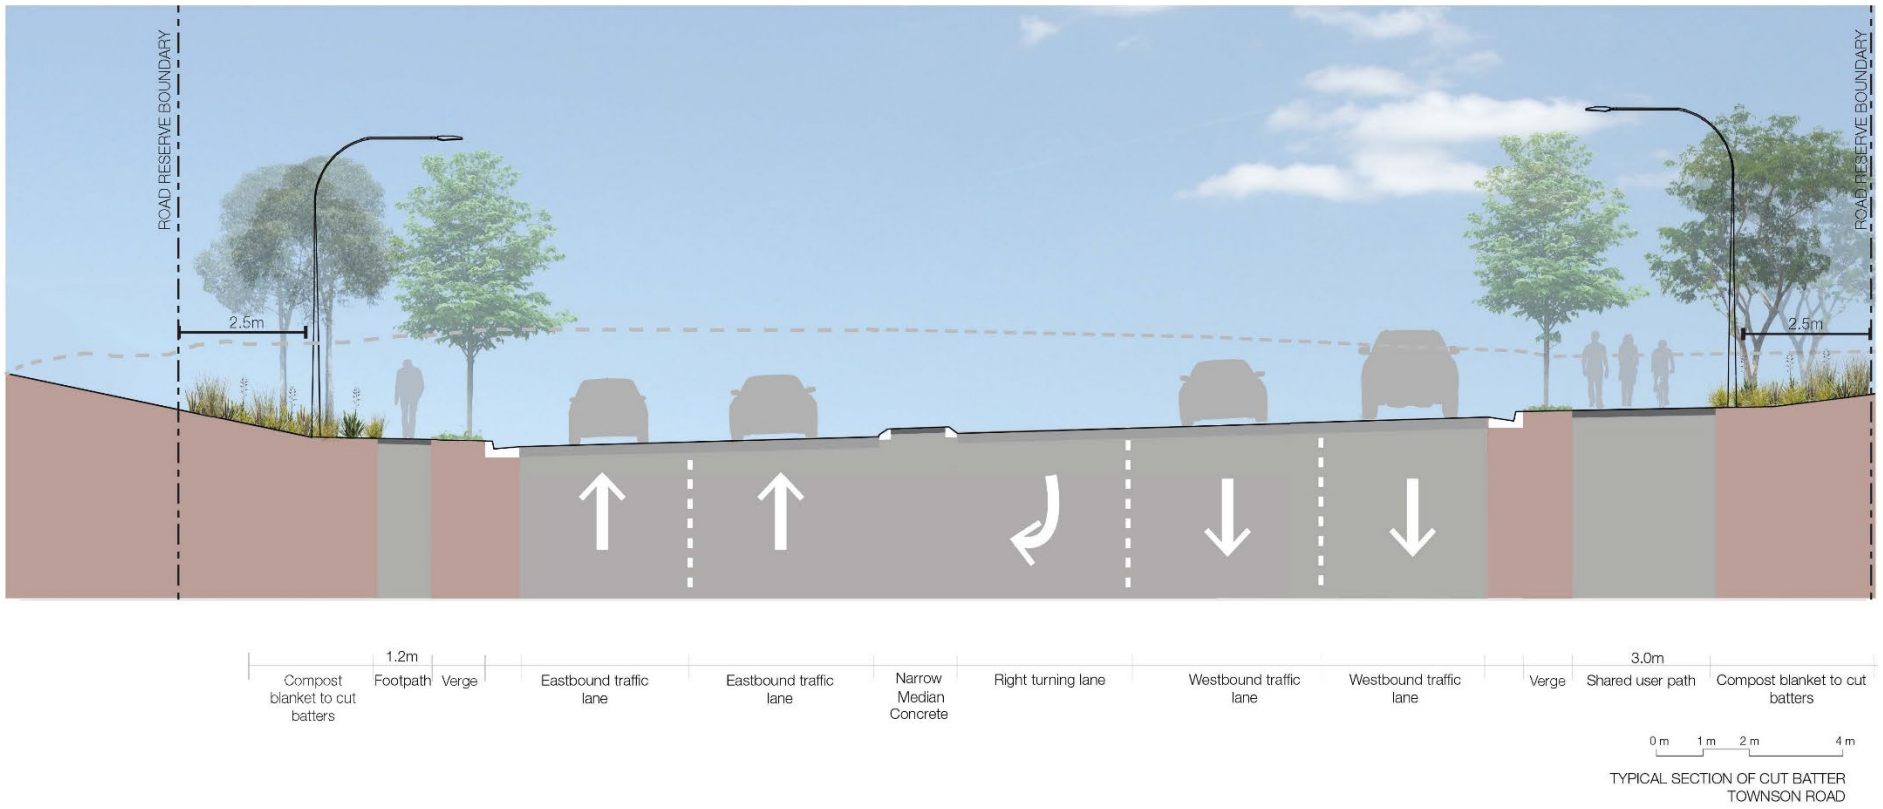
Typical section through Townson Road ultimate phase cut batters
